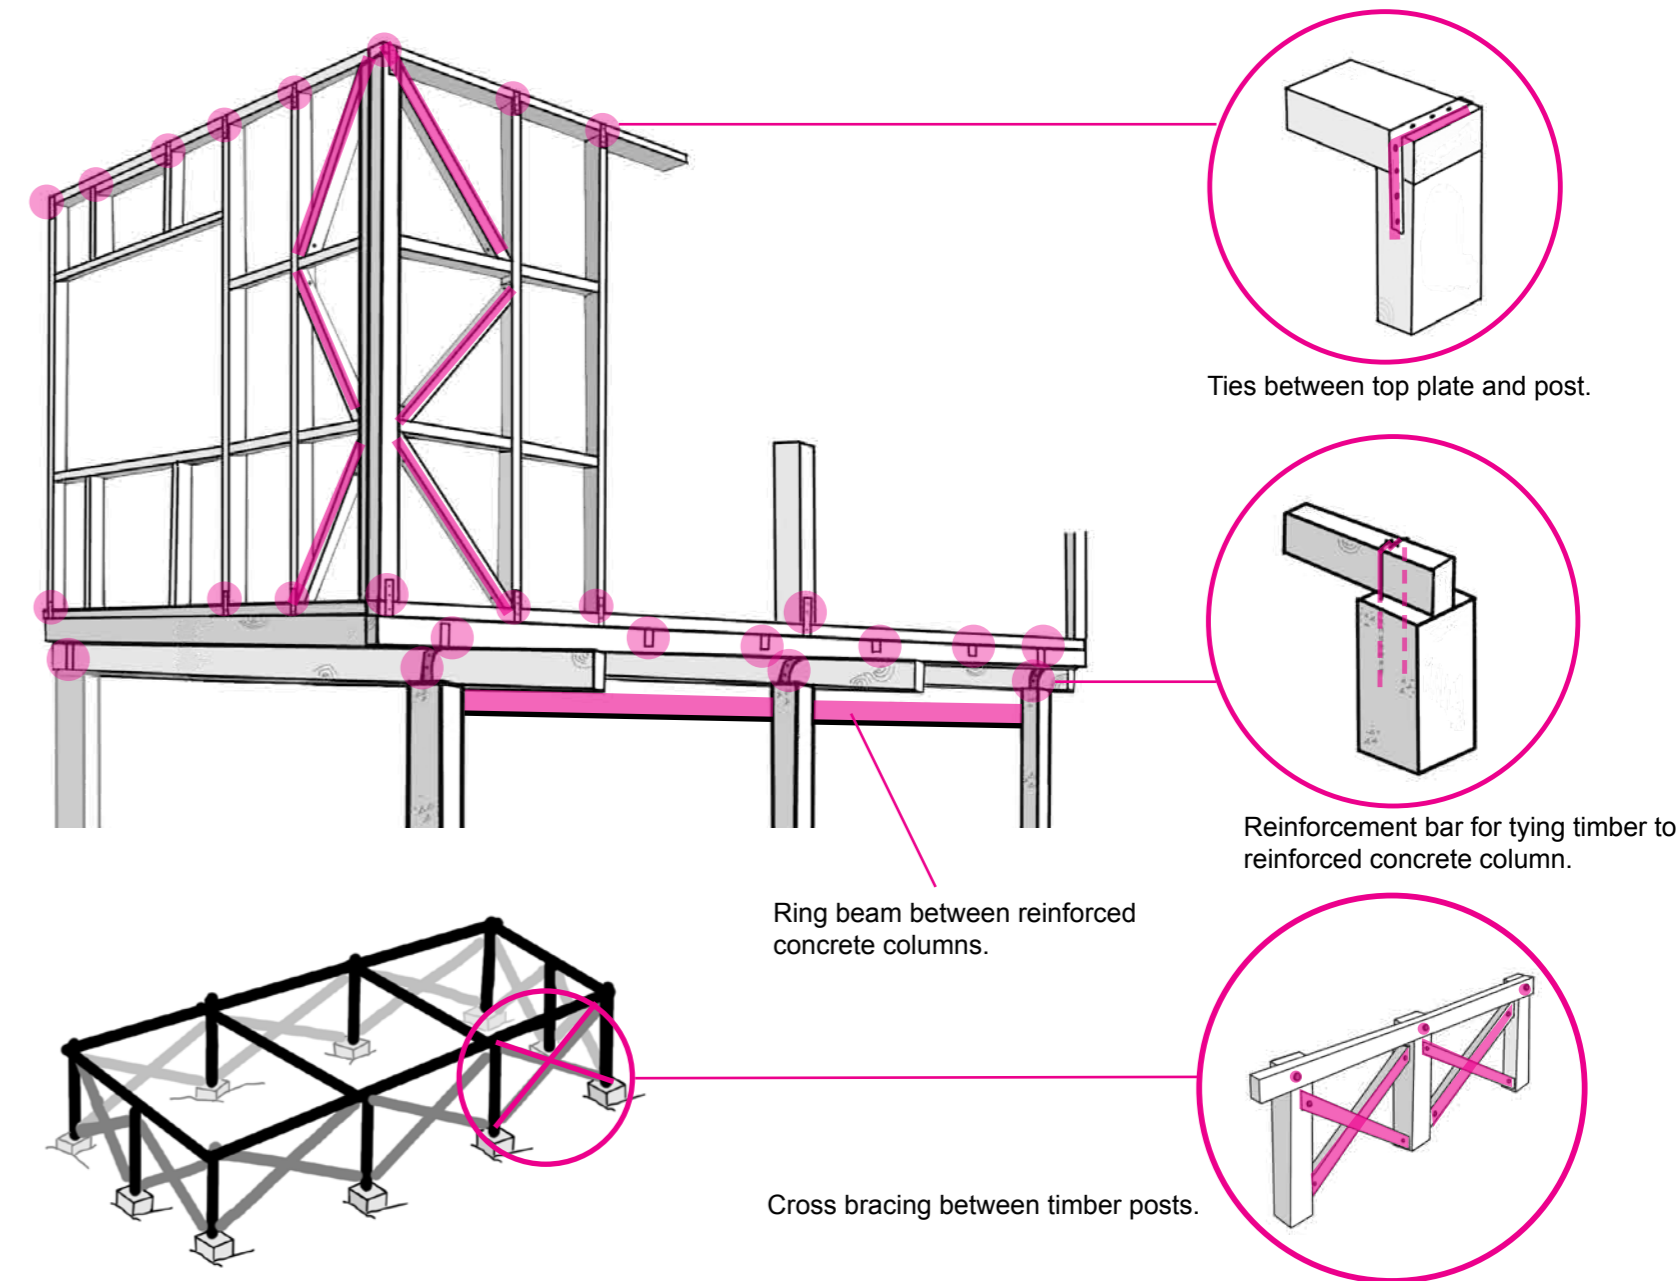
Short or floor-post detail with diagonal bracing at the corners of external walls.
